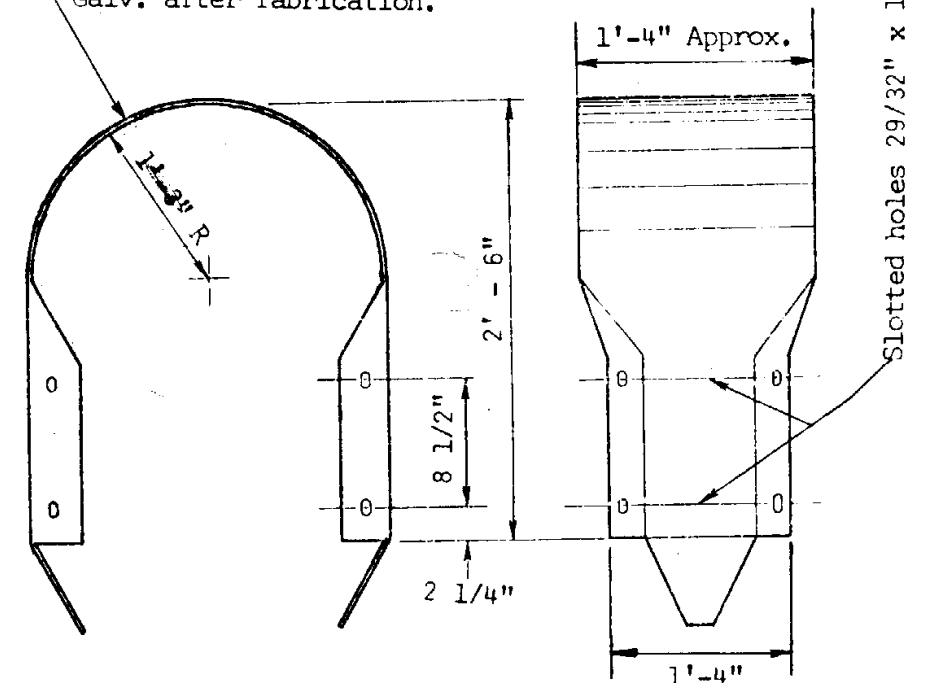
ATTACHMENT OF GUARD RAIL TO STRUCTURES
